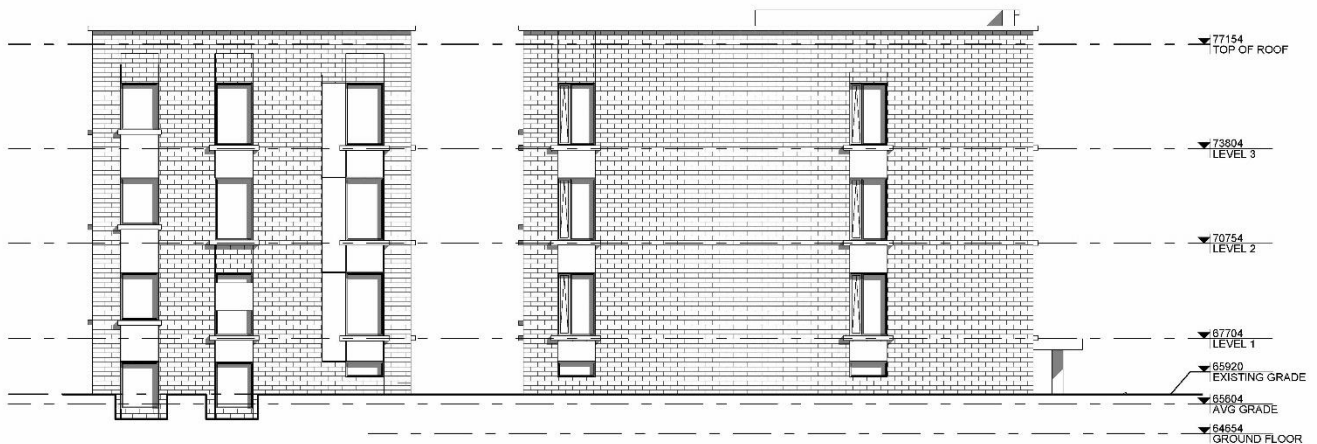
Proposed west elevation (left) and south elevation (right), prepared by CSV Architects
